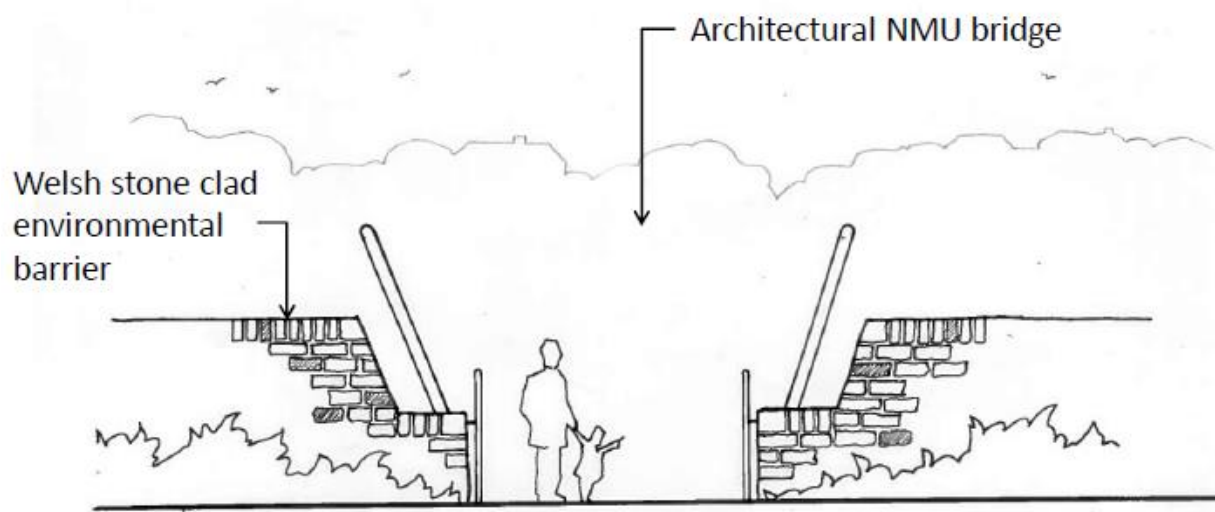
'Traditional' environmental barrier at access point to Taff Trail NMU Bridge.
